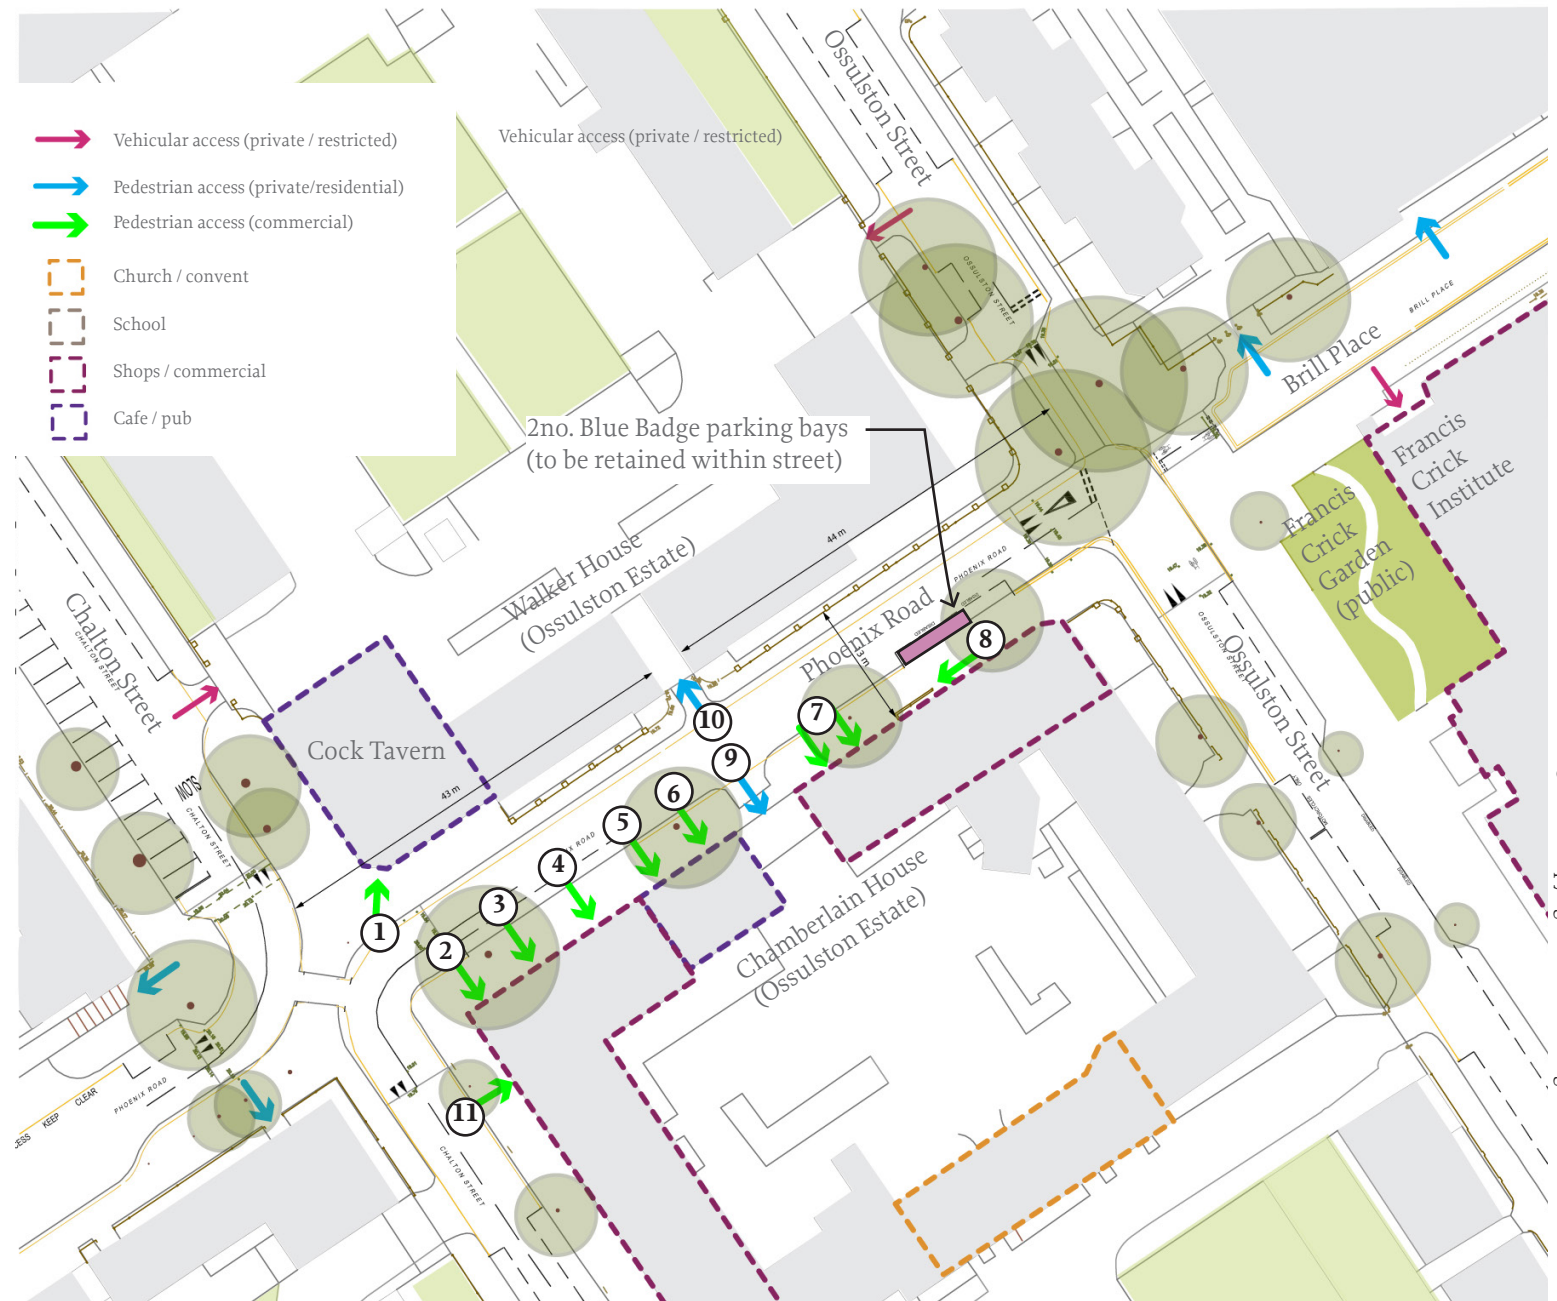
Access and circulation constraints on Phoenix Road, section between Chalton Street and Ossulston Street
